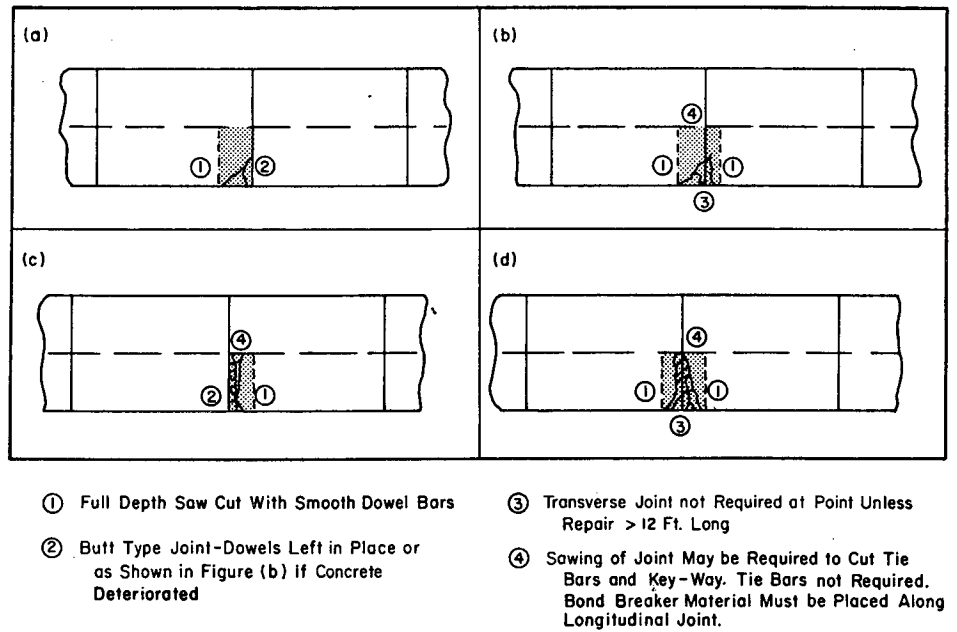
Full-depth repair recommendations for reinforced jointed concrete pavements under heavy traffic.
